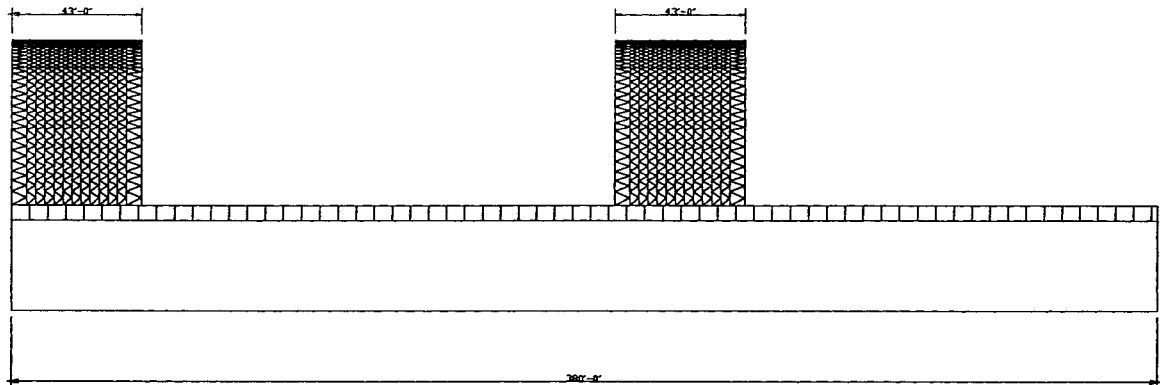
Outboard View of CMR Enclosure in Retracted Position
